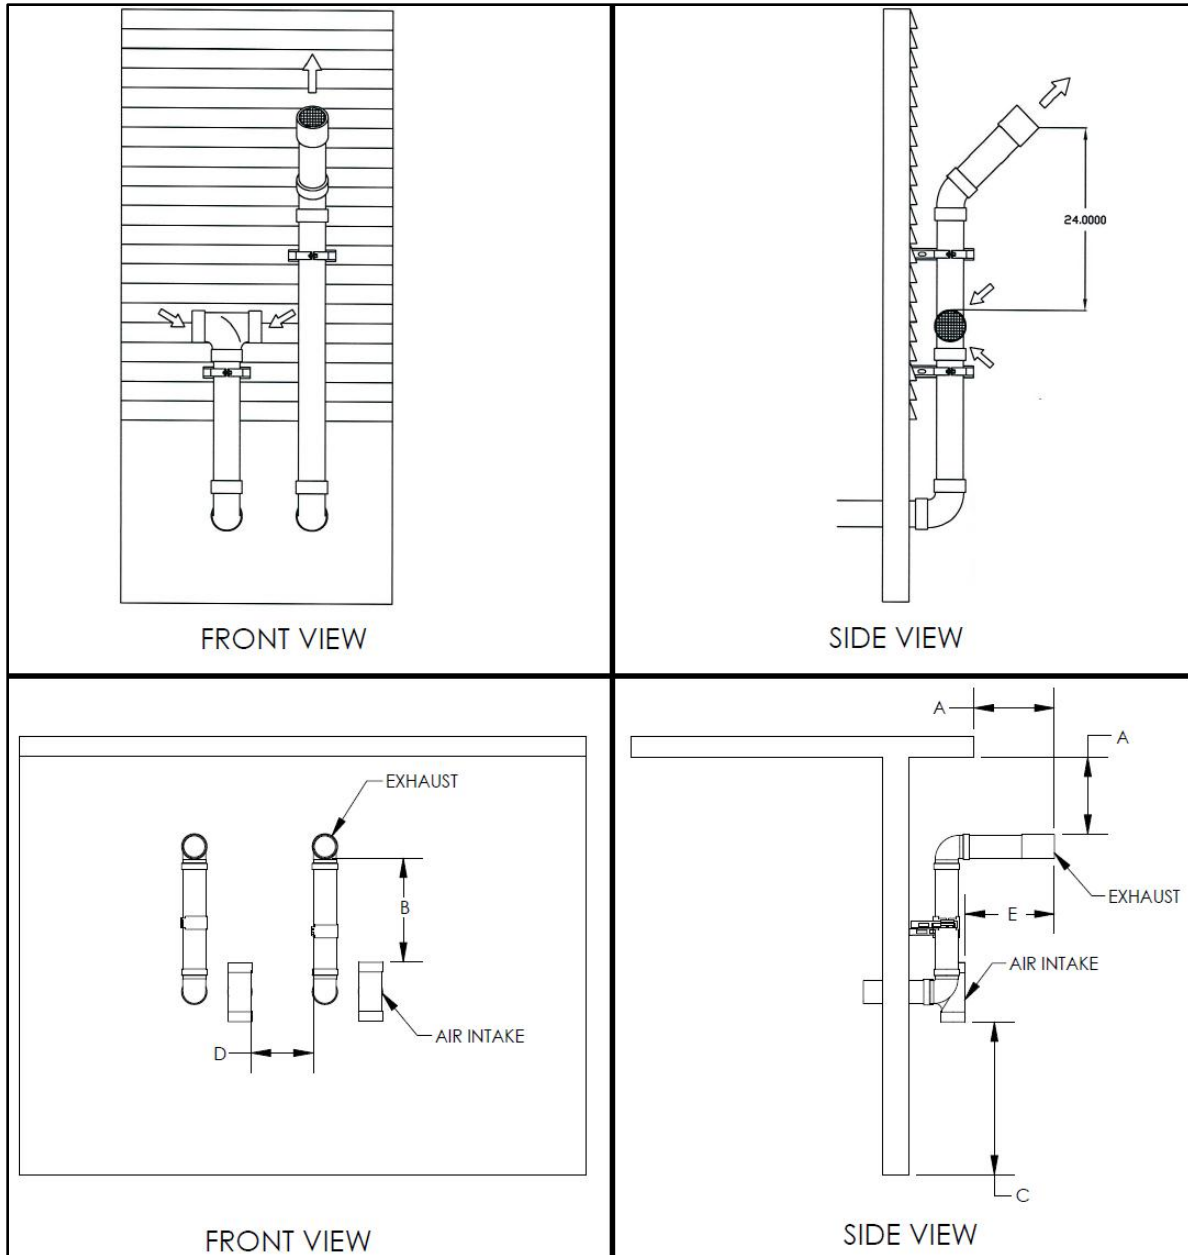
Horizontal Venting - NOTE: Drawing is meant to demonstrate system venting ONLY.
